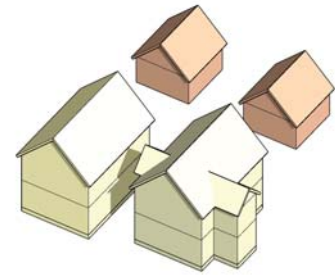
Basic massing, articulation, and opening strategies should relate to each other and break down the scale of the building.
